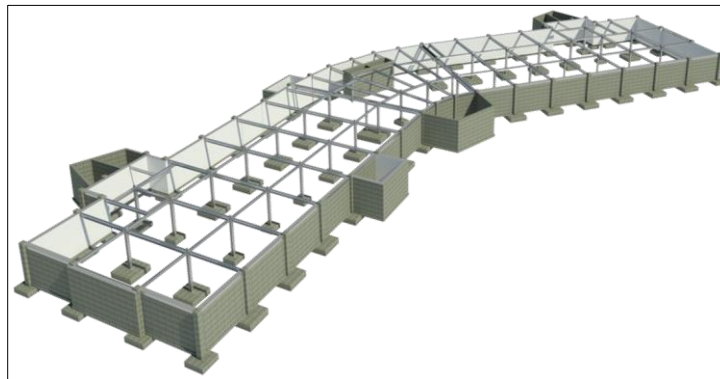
Region of Waterloo County Courthouse existing substructure 3D BIM model
